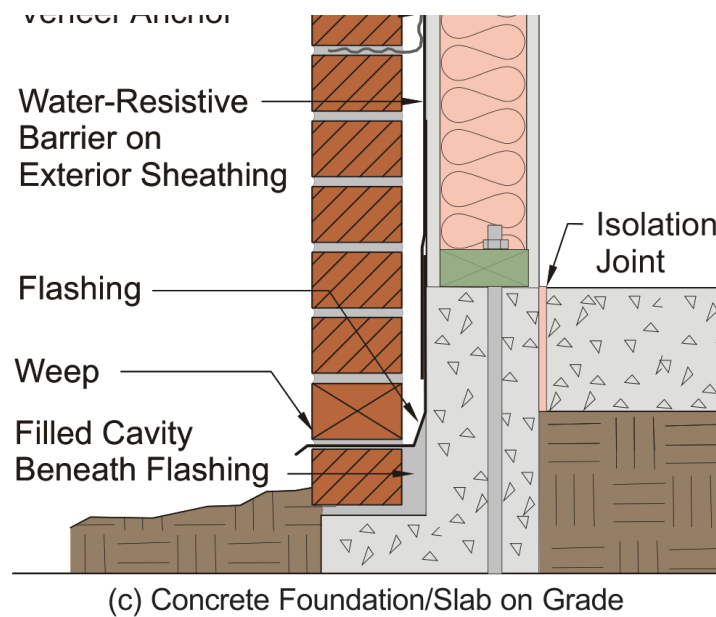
Concrete foundation with slab on grade. All three conditions share the same non-negotiables: flashing at the first course above grade, an air space maintained straight through, and the cavity below flashing completely filled with grout or mortar. Why it matters: the foundation-to-wall transition is a deliberate bond break — brick expands and concrete shrinks, and flashing at this joint absorbs that movement instead of letting it crack the wall.
